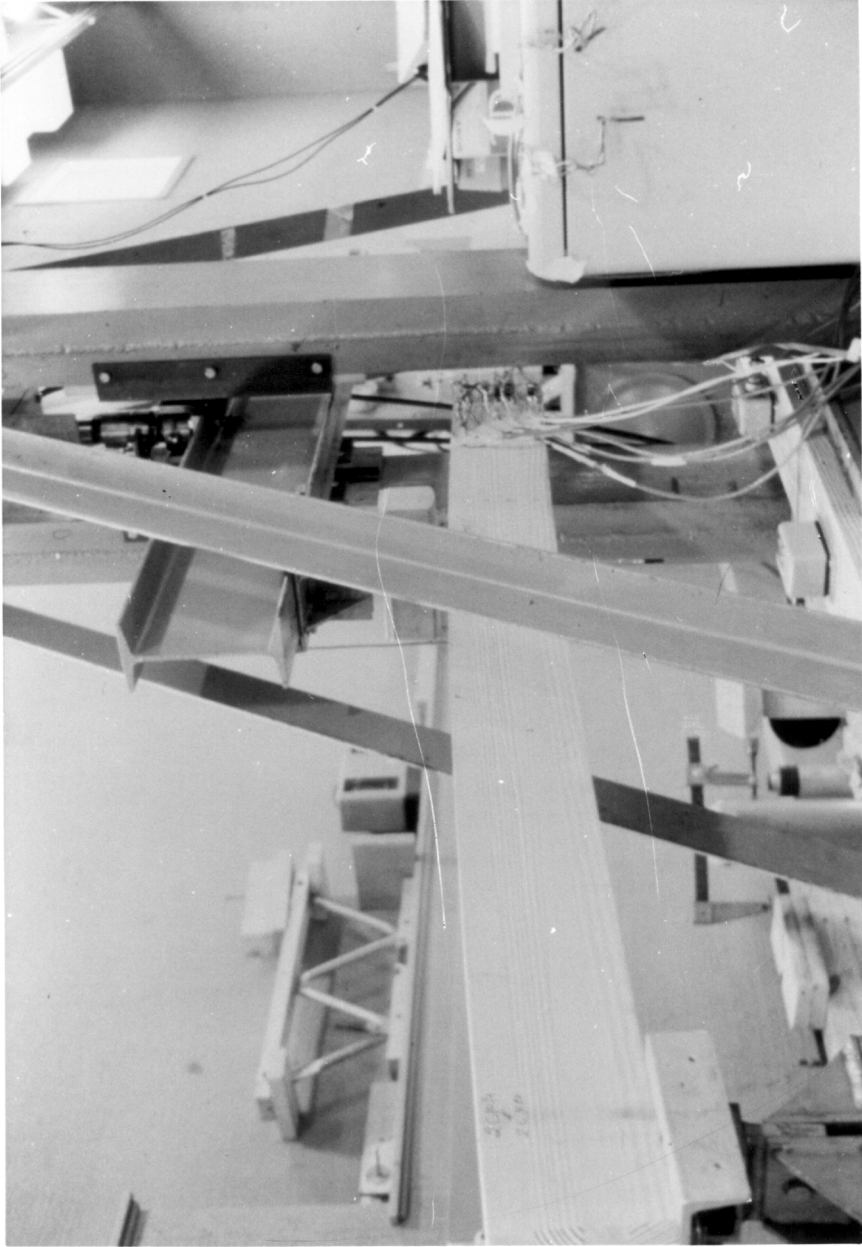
Bending set-up to test glulam beams in simple bending about 2-or 3- axis
